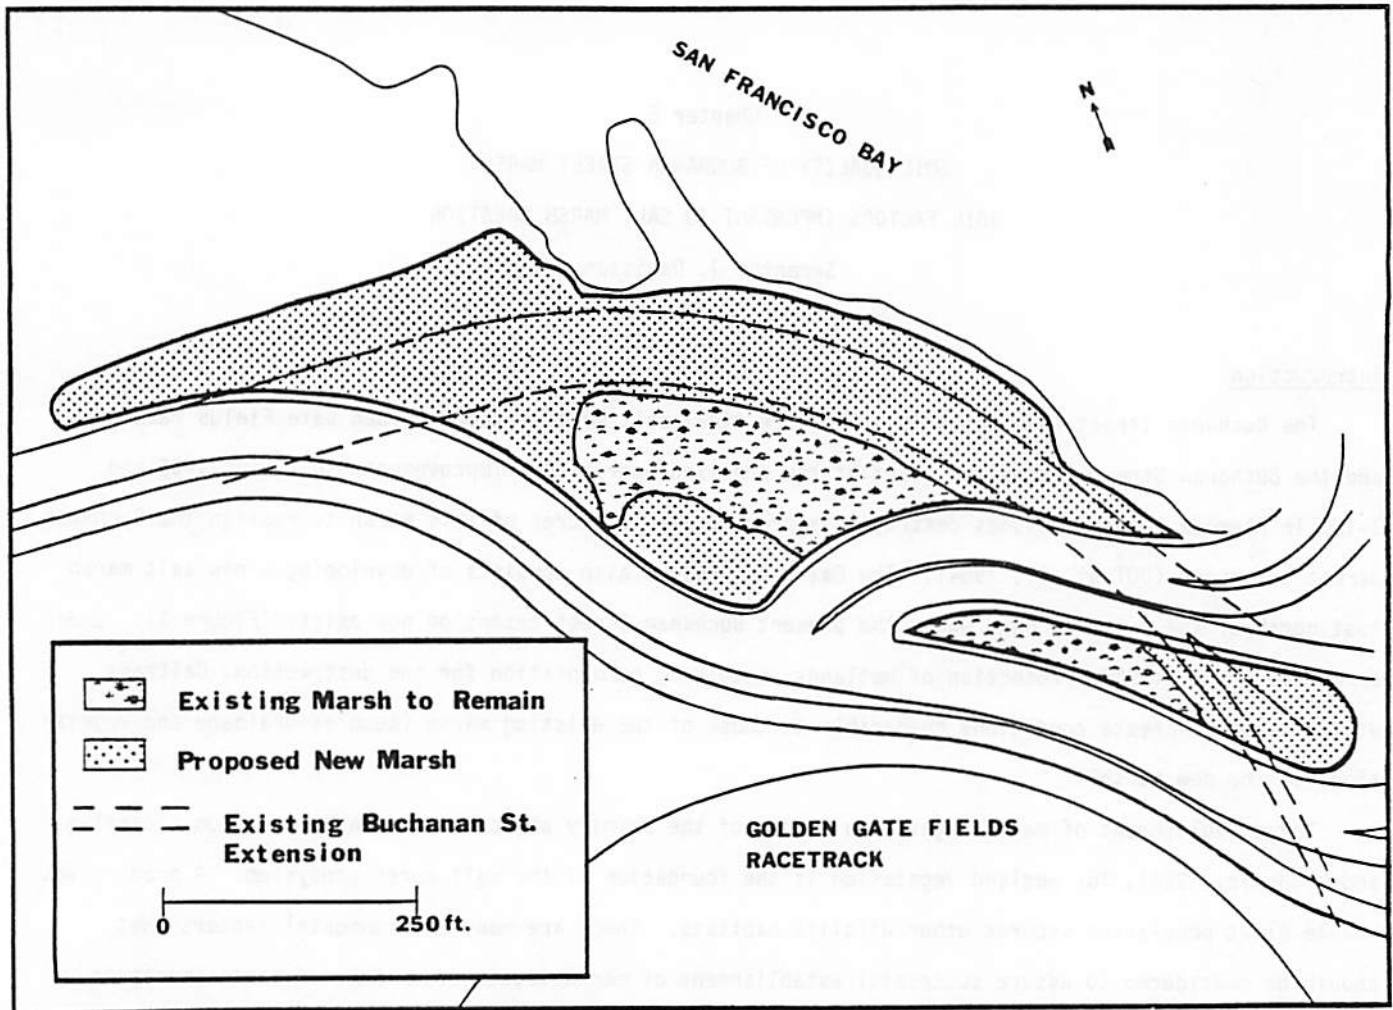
Proposed Area for Mitigation and Planned New Roads at Buchanan Street Marsh (Note: This is an incomplete plan.)
